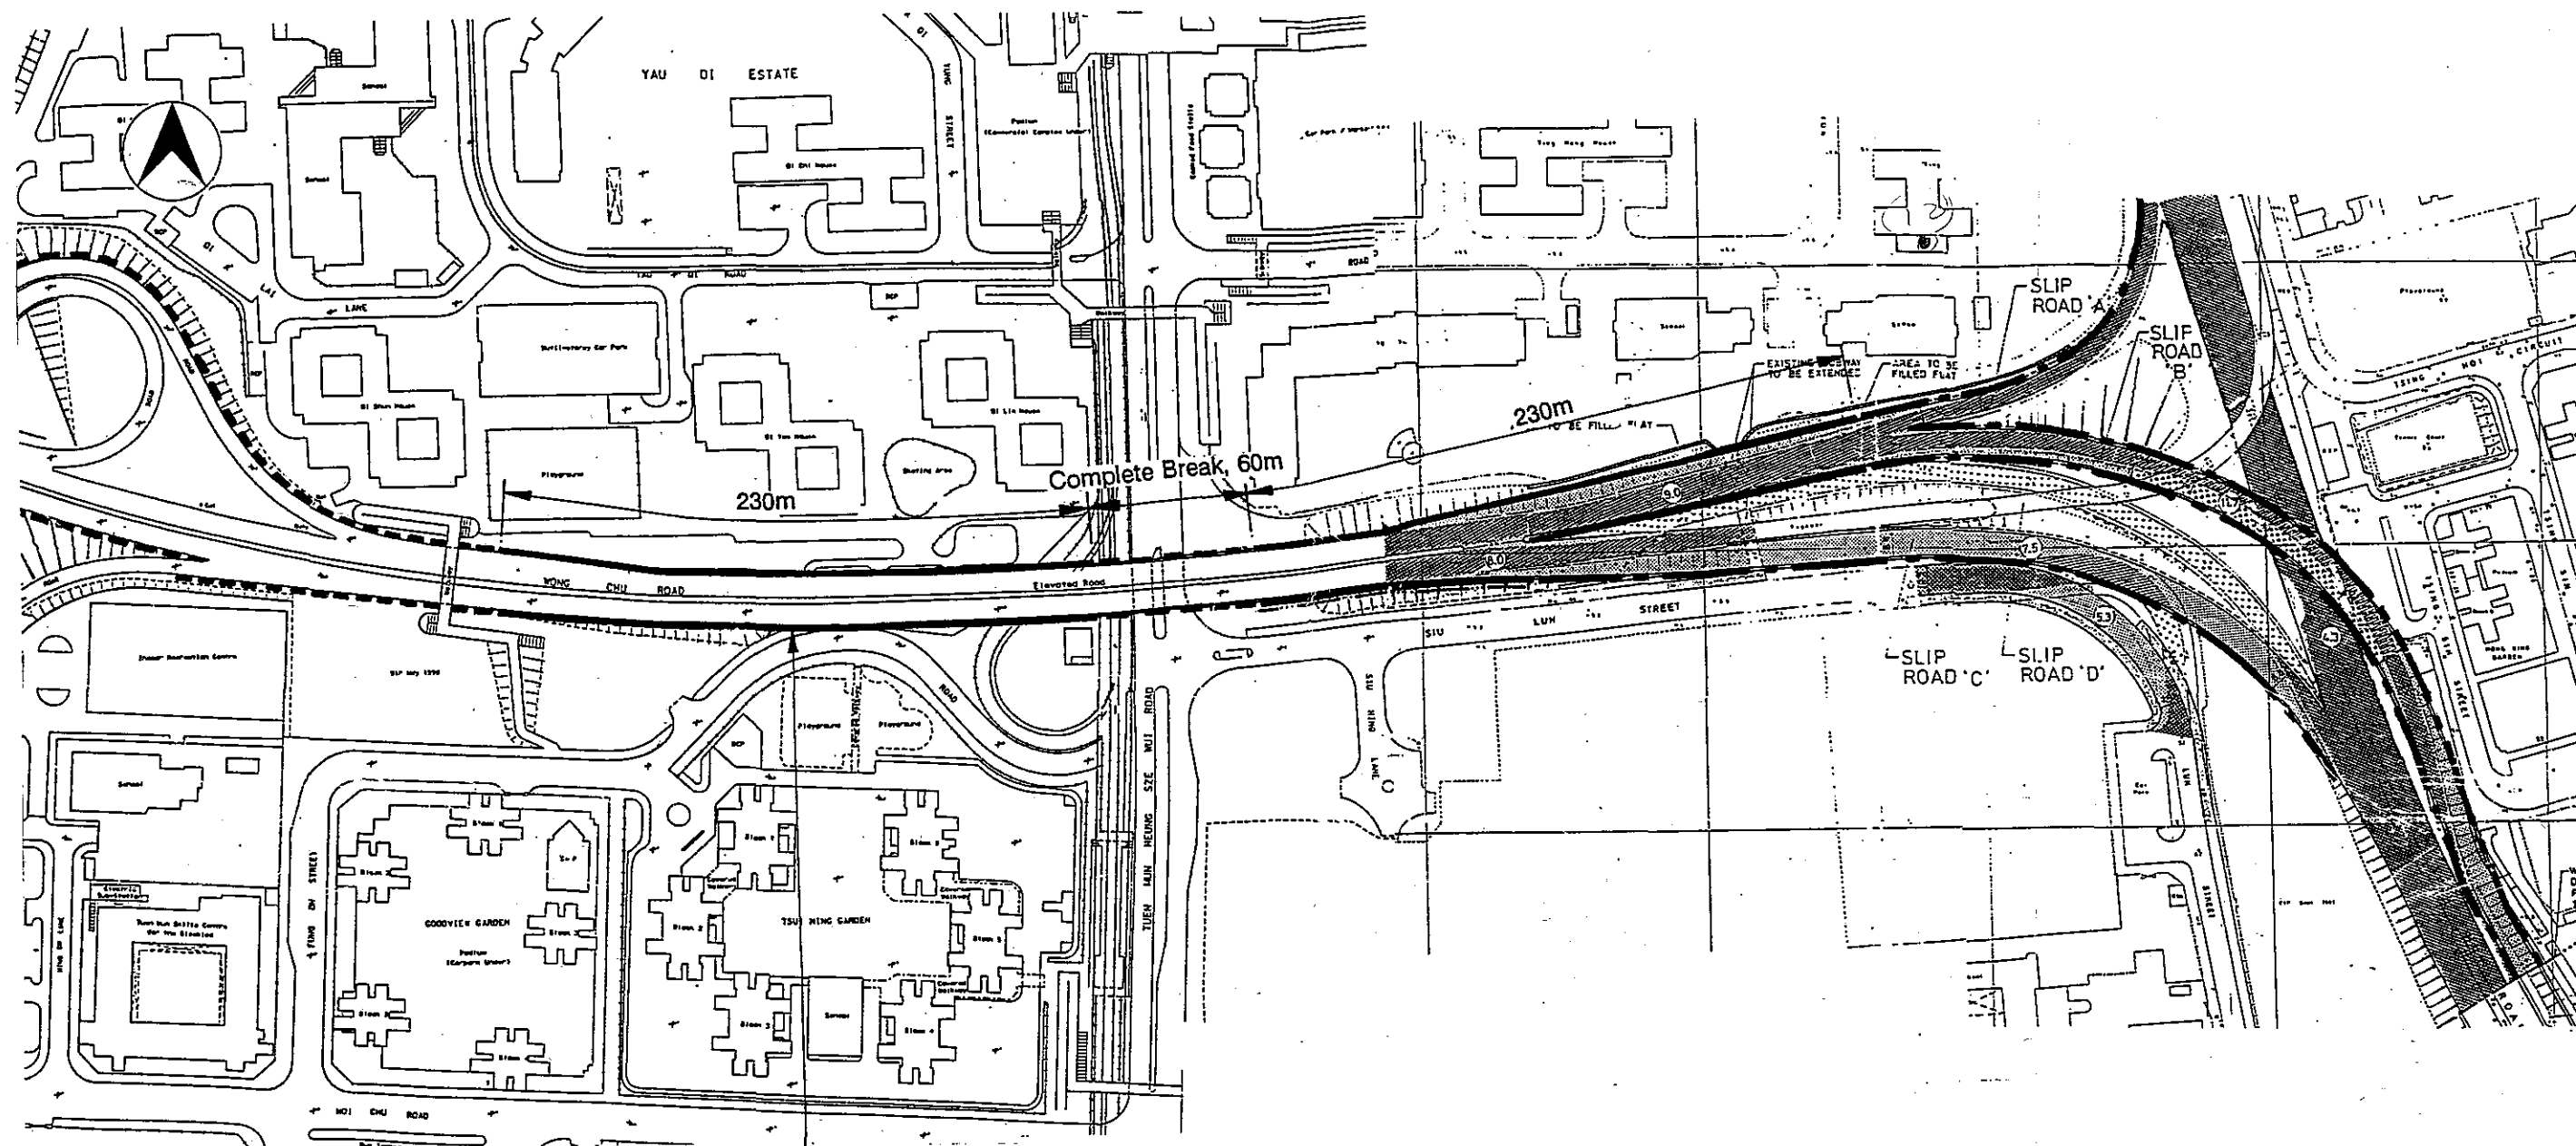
BARRIERS/CANTILEVERBARRIERS CONCEPTUAL DESIGN DRAWING
